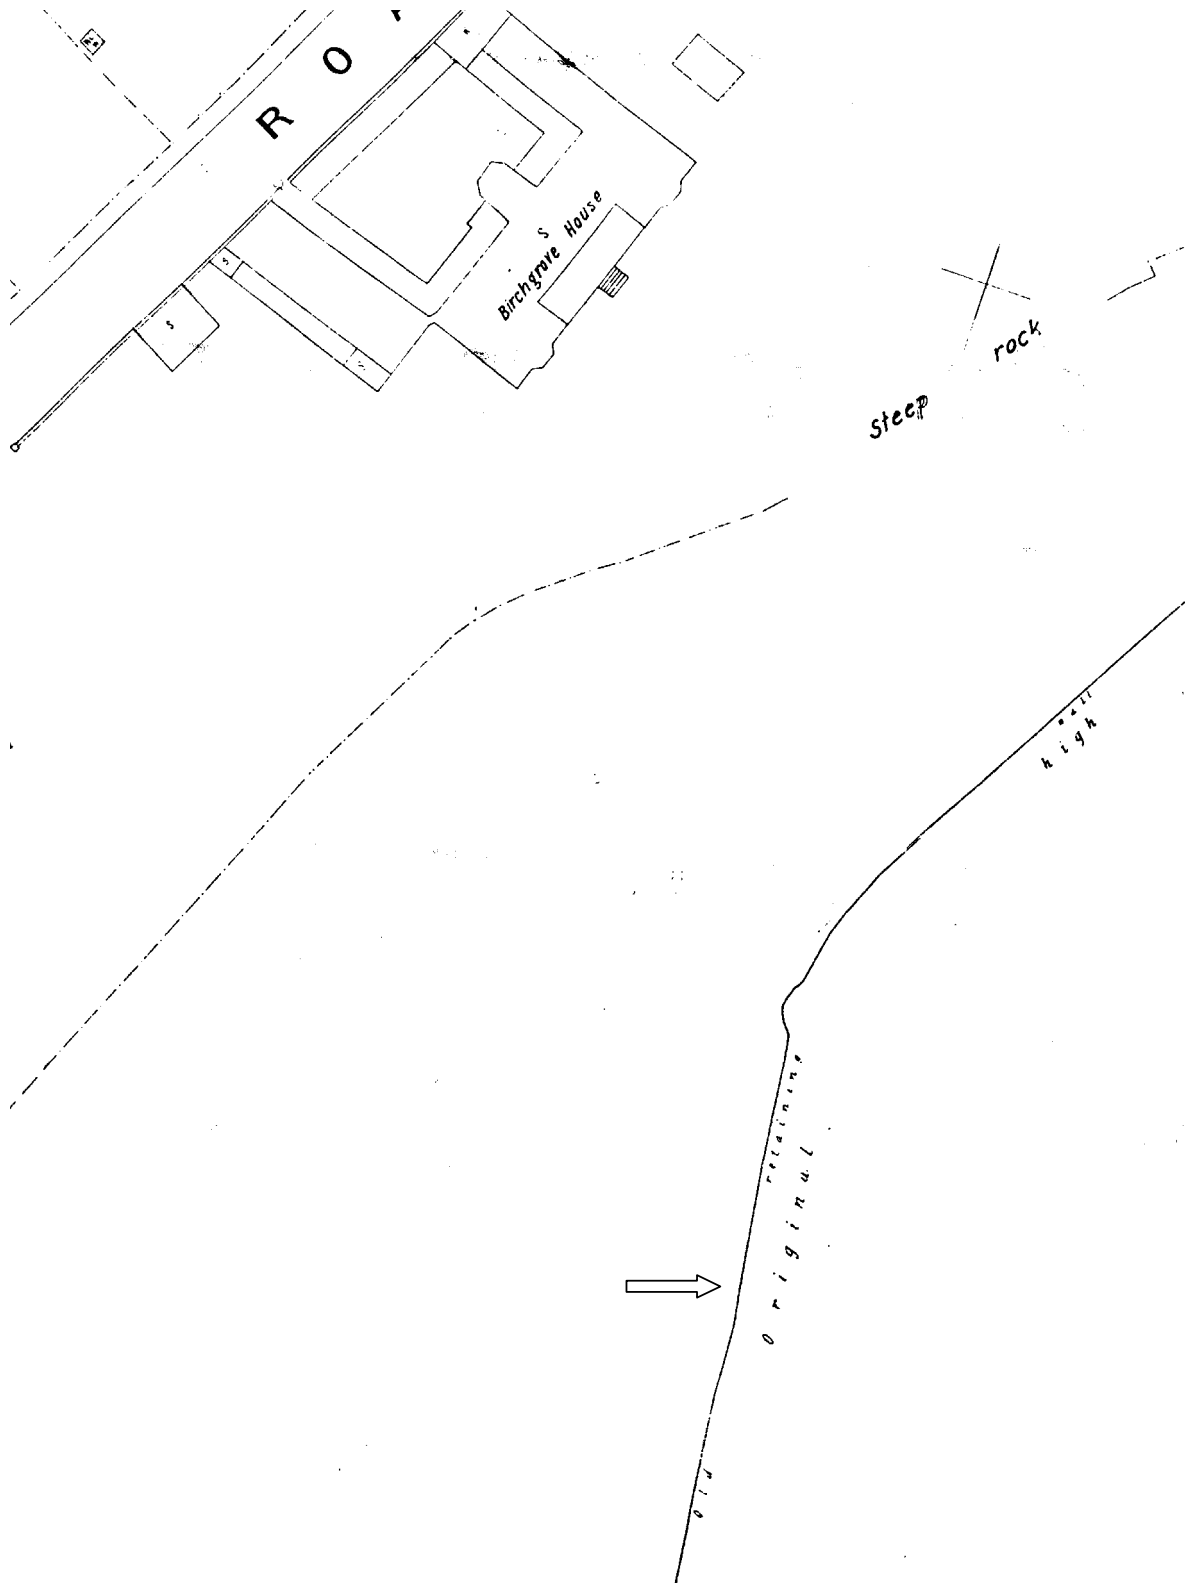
Excerpt from a Water Board plan Balmain Sheet No.2 PWD 317 catalogue 1544 of 5.1. 1888 showing the 'old retaining wall' (arrowed) above the original high water mark, with the footprint of *Birch Grove House* at the left.
